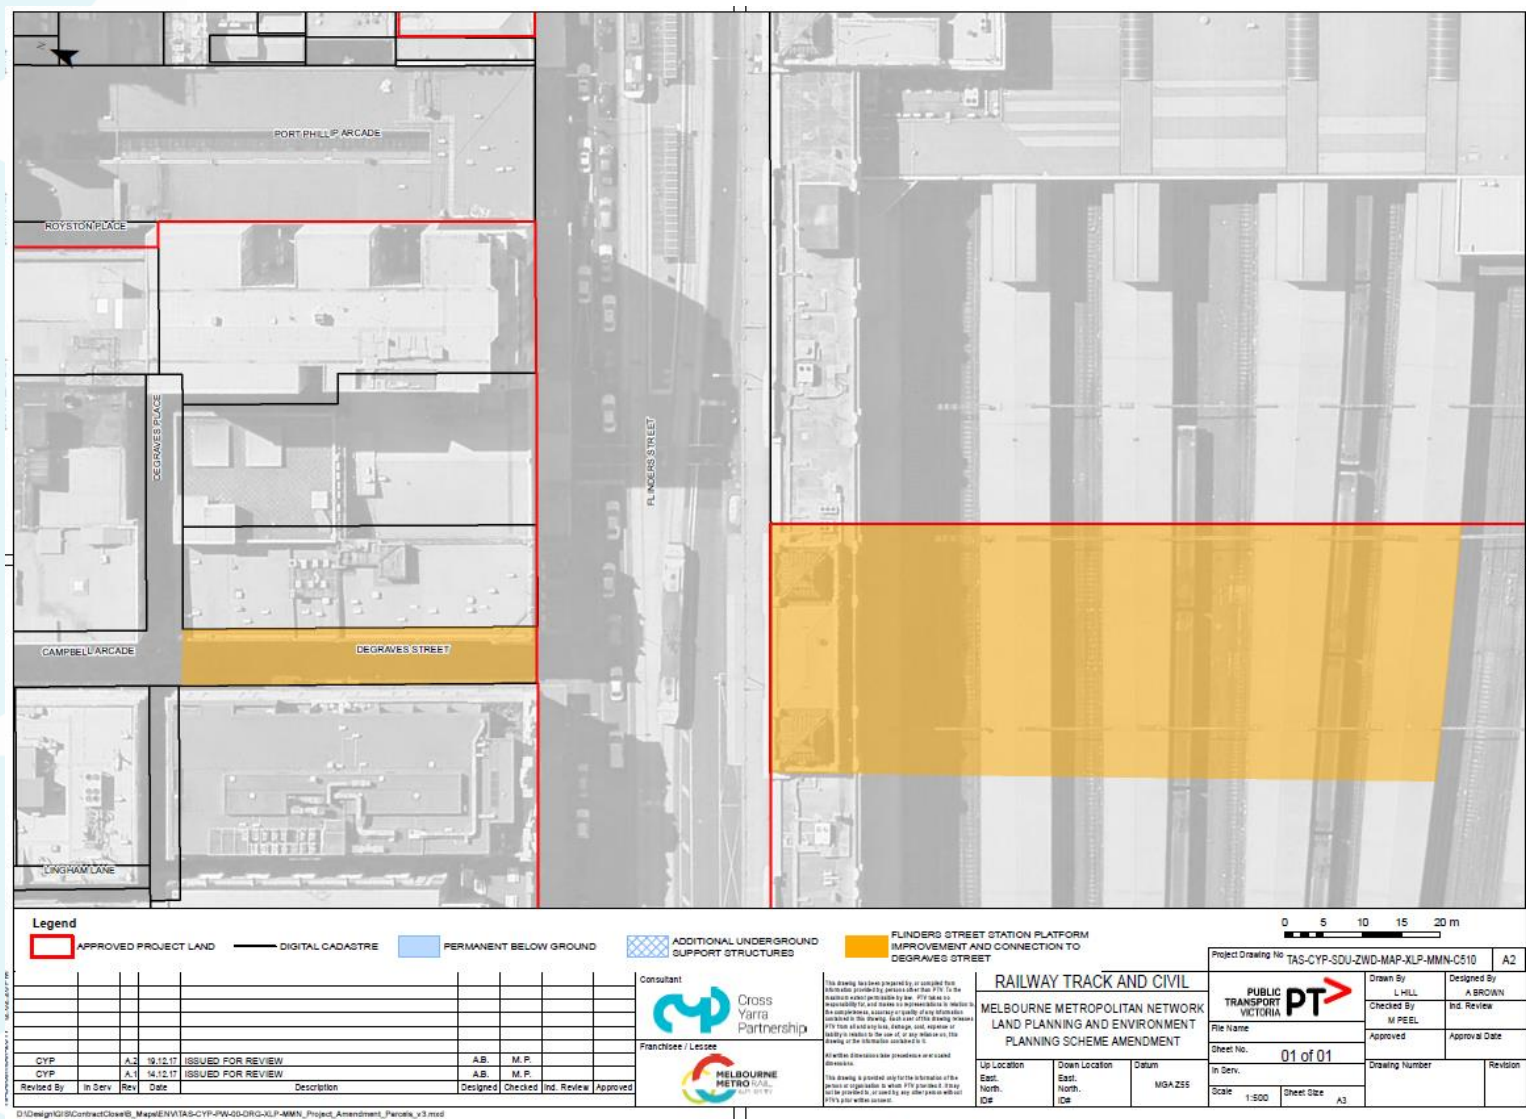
ADDITIONAL PROJECT LAND REQUIRED FOR FLINDERS STREET STATION PLATFORM IMPROVEMENTS AND CONNECTION TO DEGRAVES STREET
